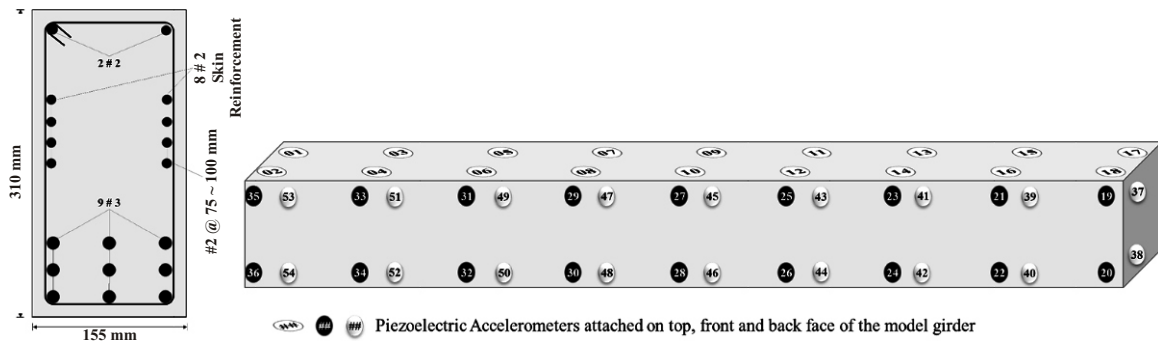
Model girder cross-section and Piezoelectric Accelerometers arrangement
